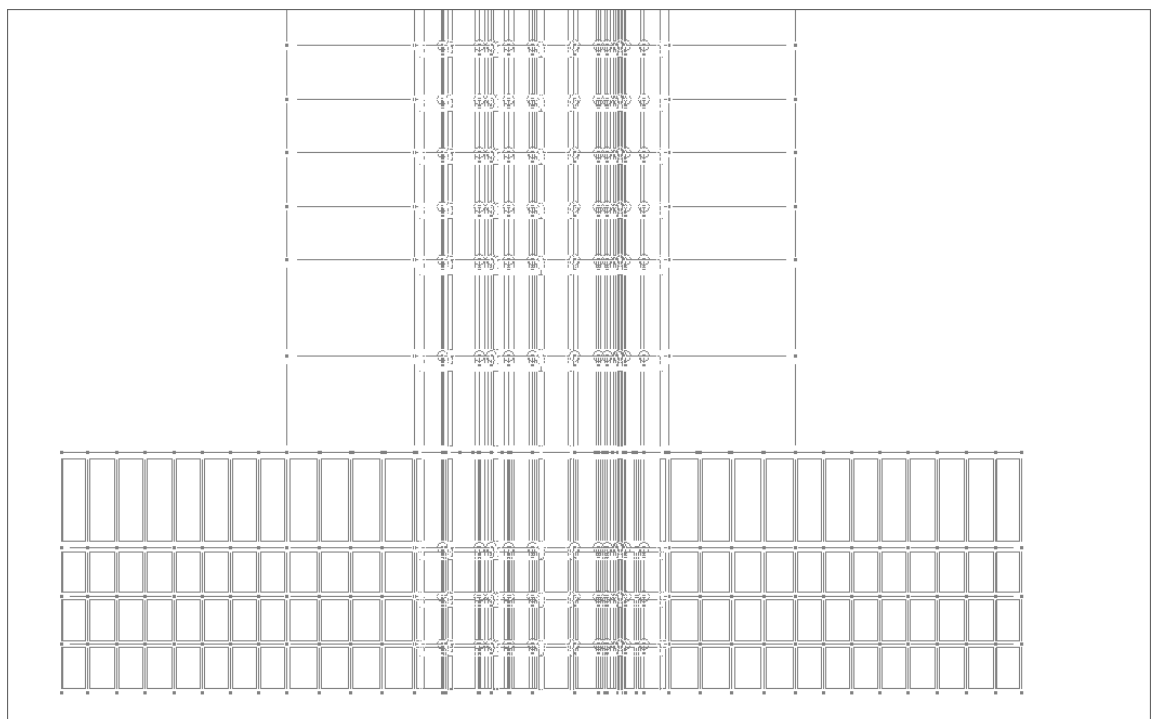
Mass Assignment at Mass Center for Typical Floor of Case Building
